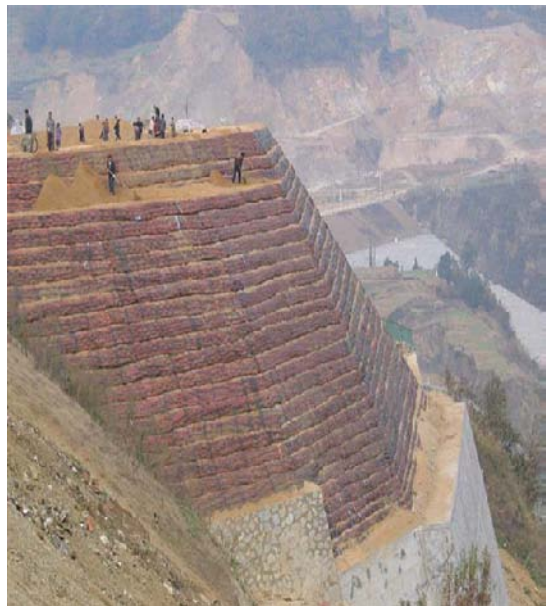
The construction finished of geogrid reinforced soil retaining wall
